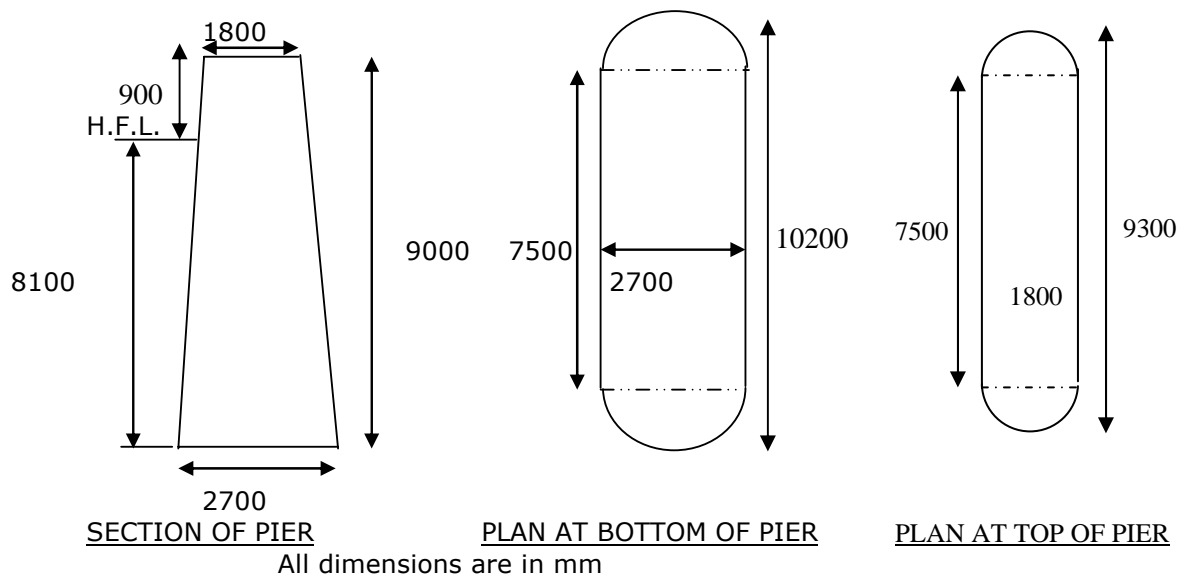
SECTION, TOP AND BOTTOM PLAN OF PIER
